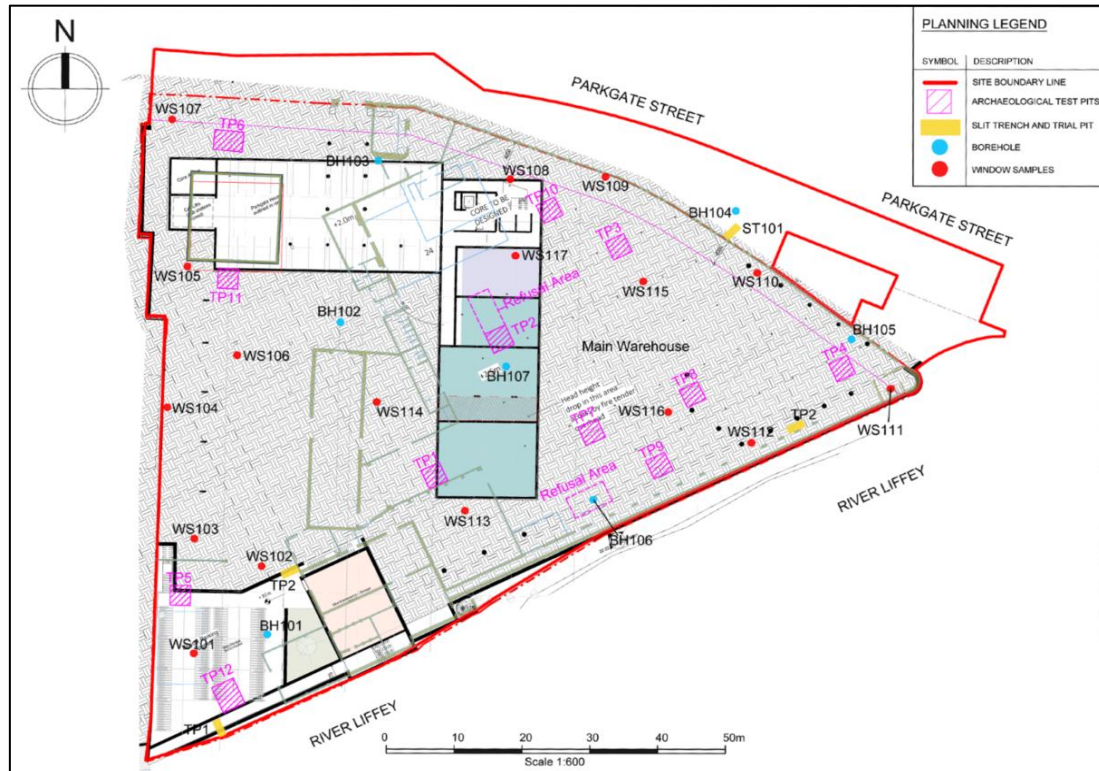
Overlay of existing site with test pit locations onto the proposed basement layout
